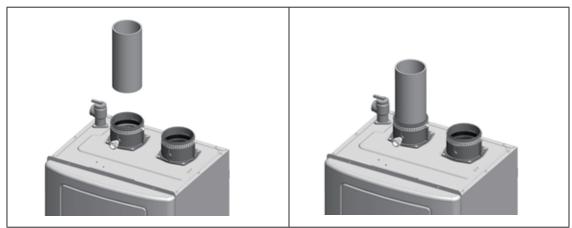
Installing the 3" Pipe into the Exhaust Vent Connection
